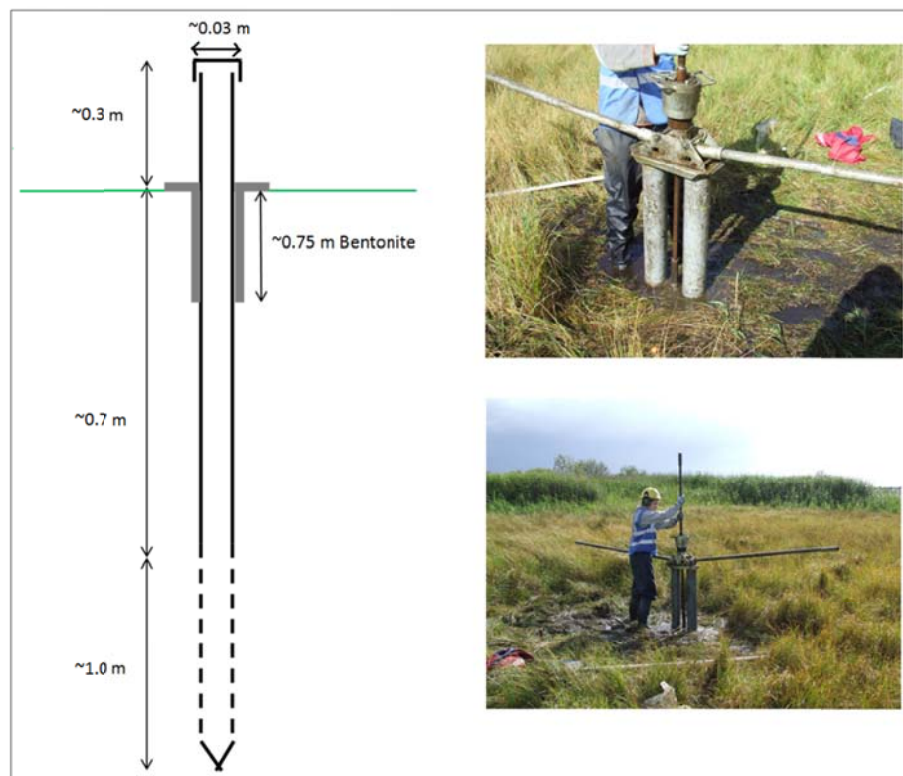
Installation of piezometers at Rockmarshall, showing schematic detail of a typical piezometer.
